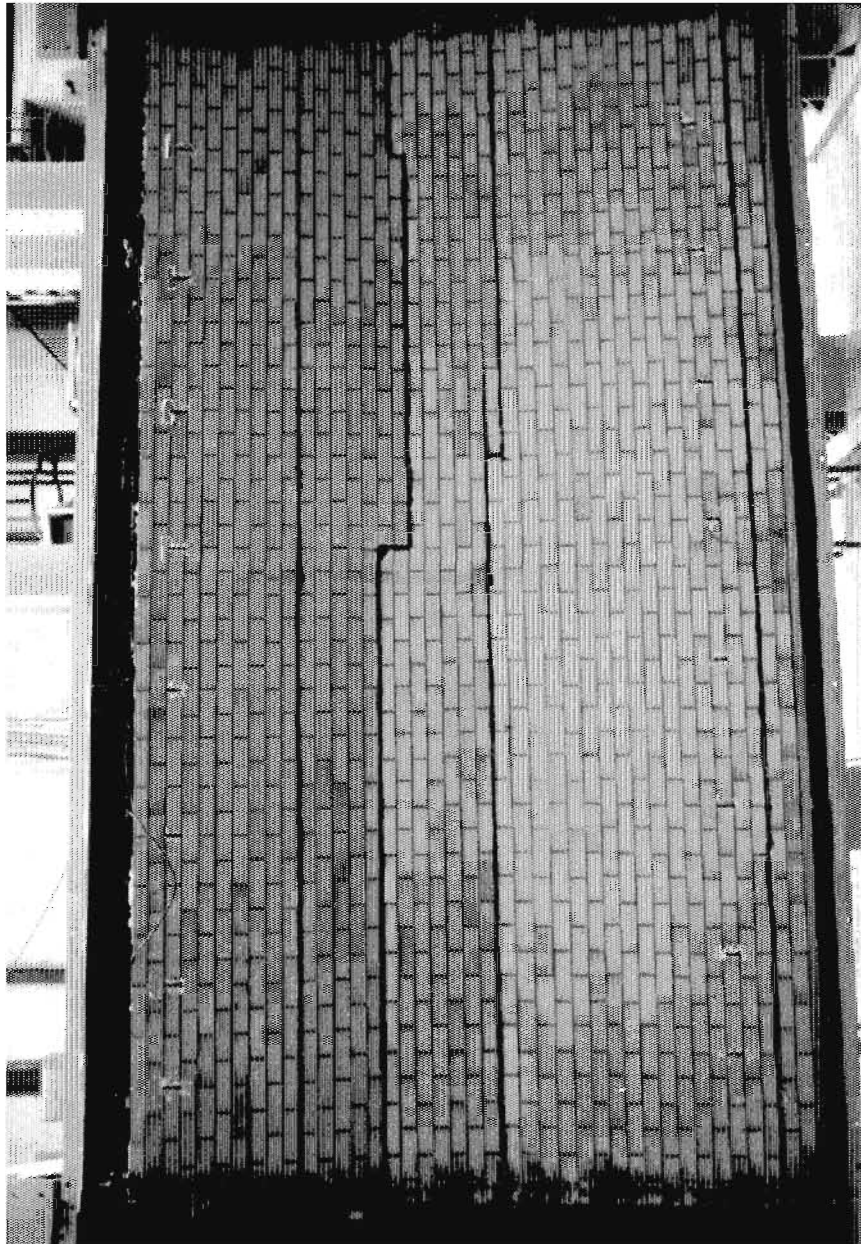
CRACK PATTERN AT FAILURE - WALL I
